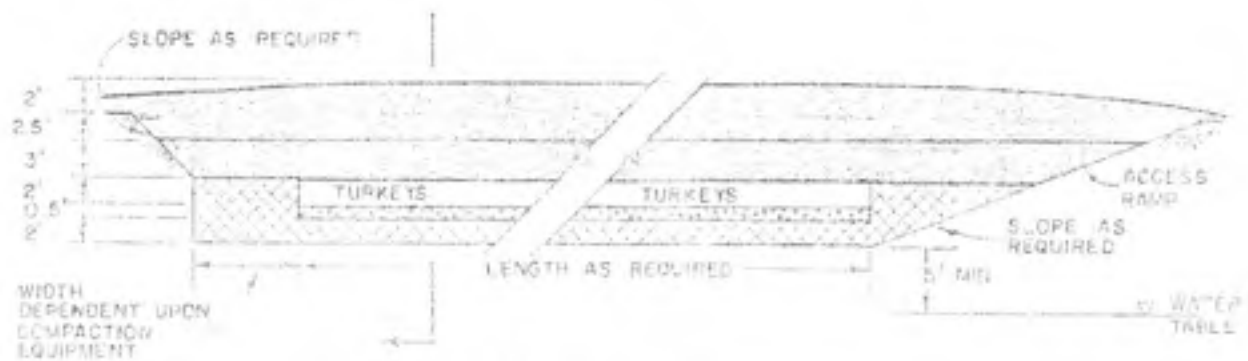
(longitudinal section of on-site burial pit) (From 1984 AITF On-Site Disposal Memorandums)
